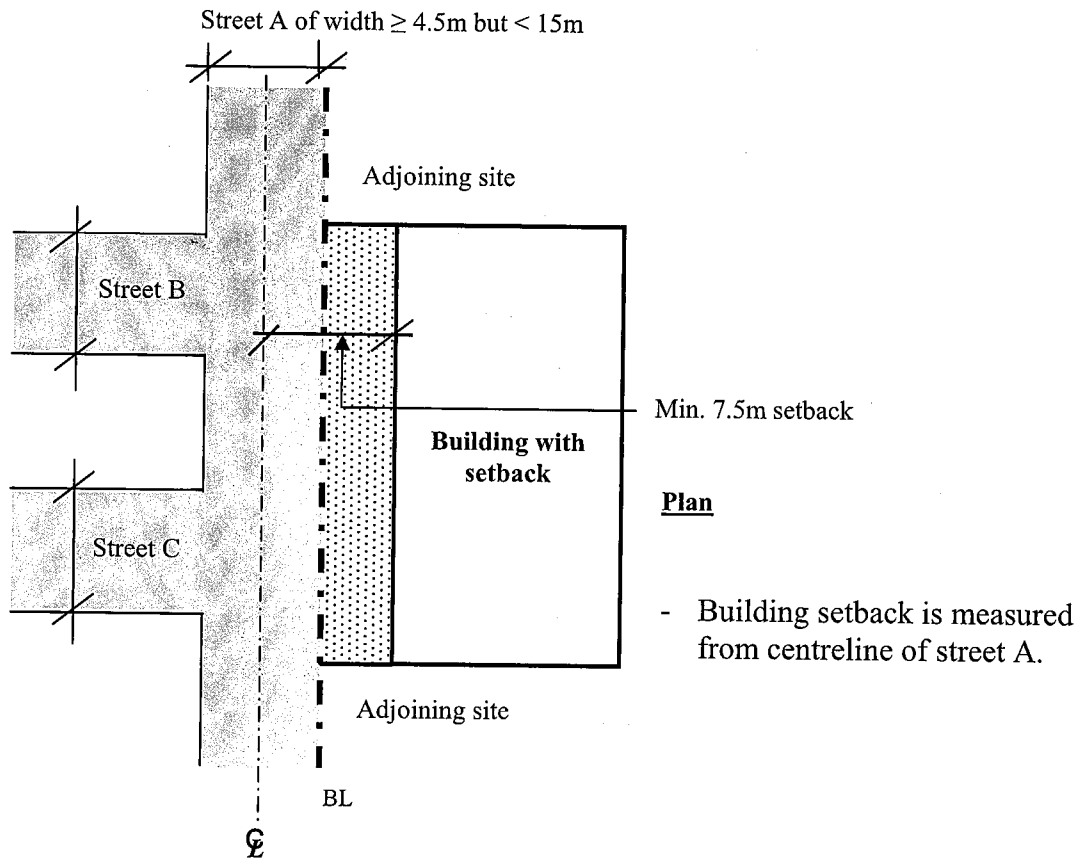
Example (3) of Building Setback - Site abutting streets at intersections
